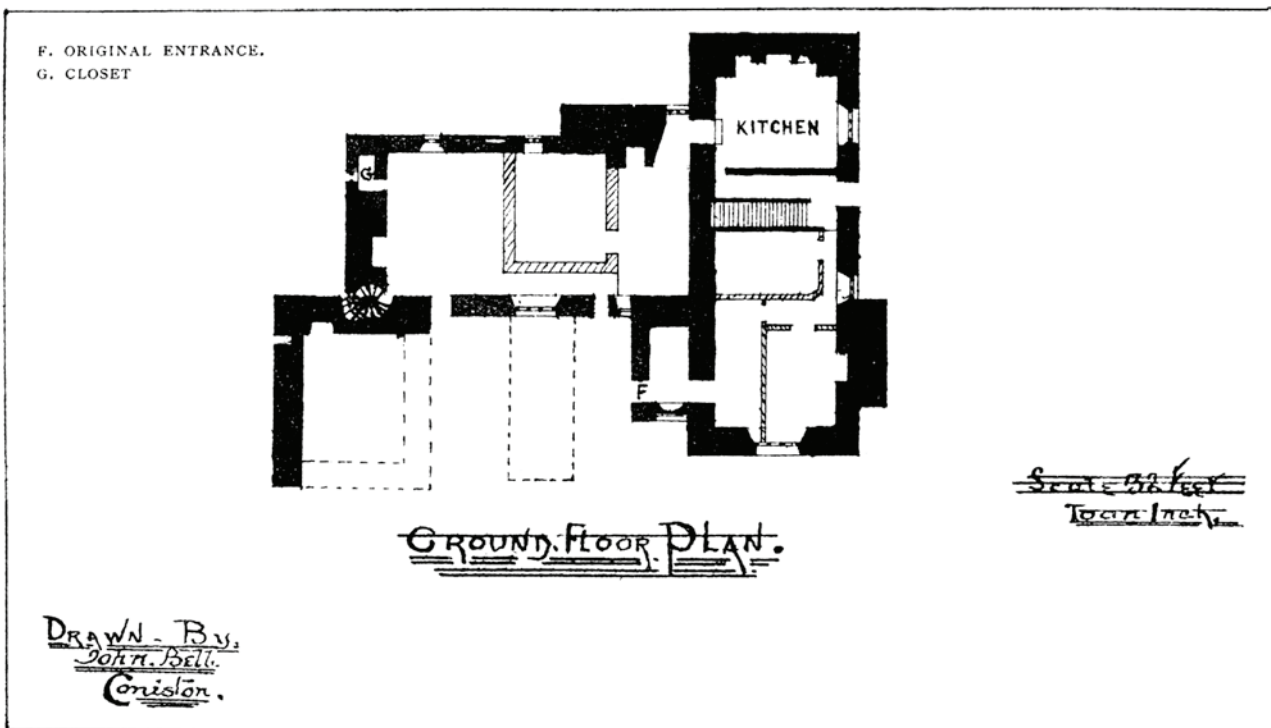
The ground floor of Coniston Hall illustrated by John Bell (after Cowper 1888)
